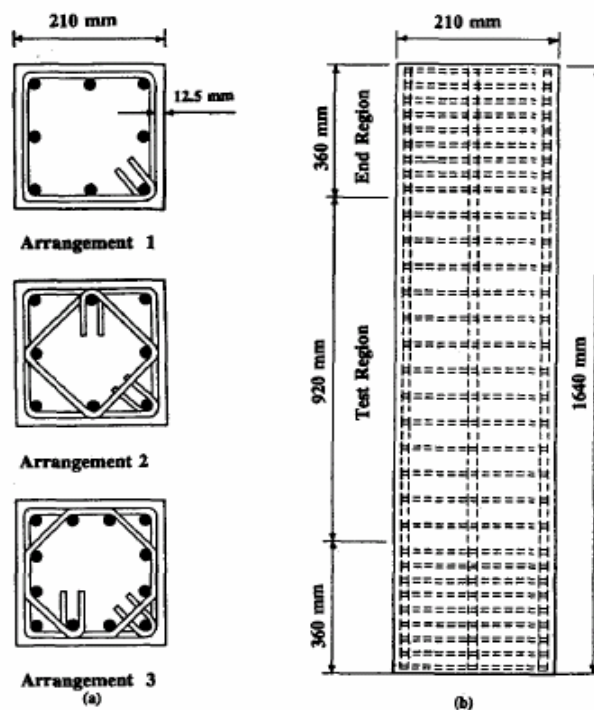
Reinforcement Arrangements and Geometric Properties of Column:
